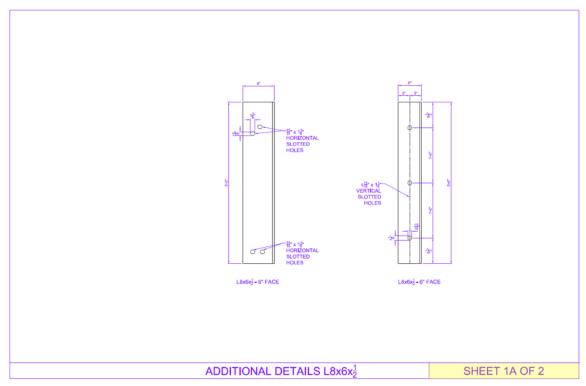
Engineering Drawing. fabricated k-frame replica (2 of 3)
